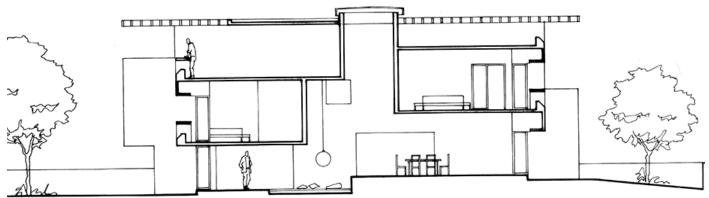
Sections Parekh House (Charles Correa Foundation, 2022)
